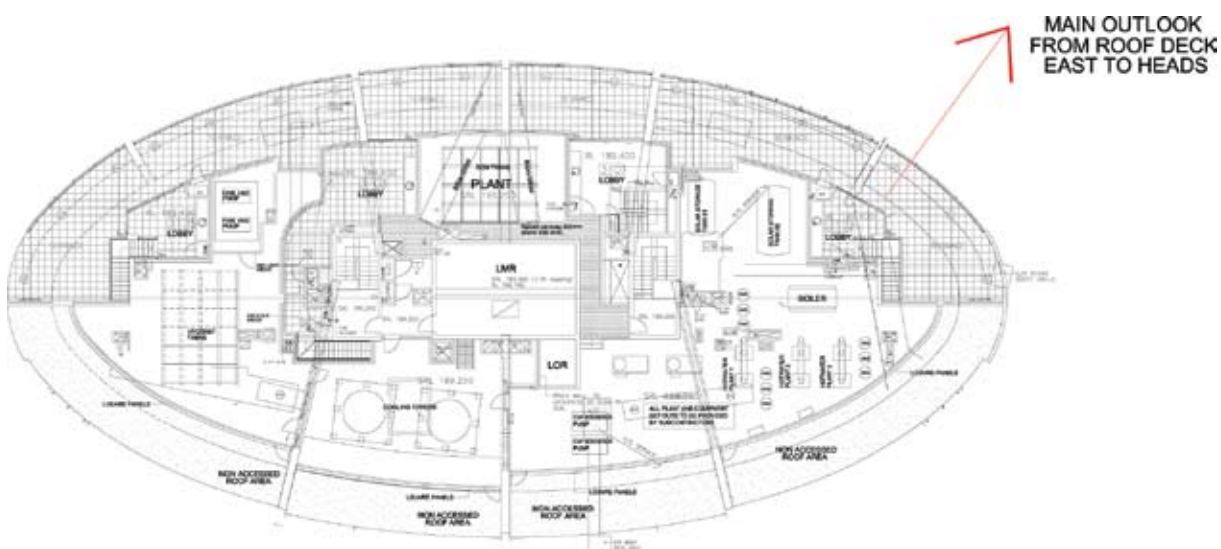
Floor plan of Level 32 Epica (roof terraces)
